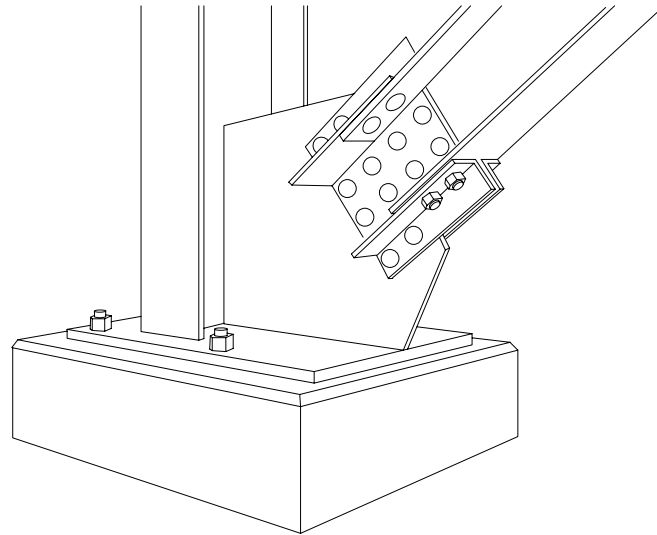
Gusset plate-base plate interaction in a braced frame [courtesy of R.Drake, 2003]
